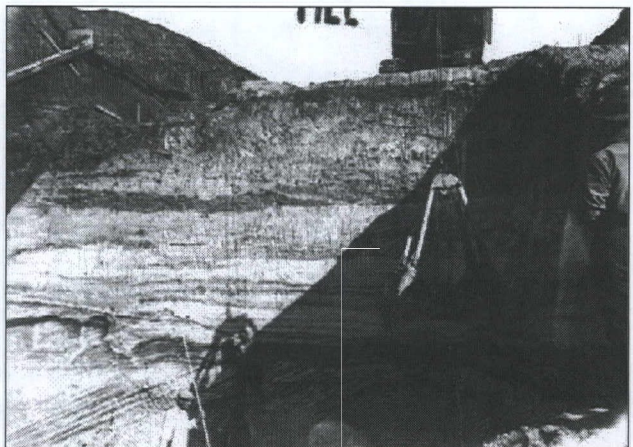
View of earth strata exposed during construction of great wall (RCP-CRF, November 8, 1929).
